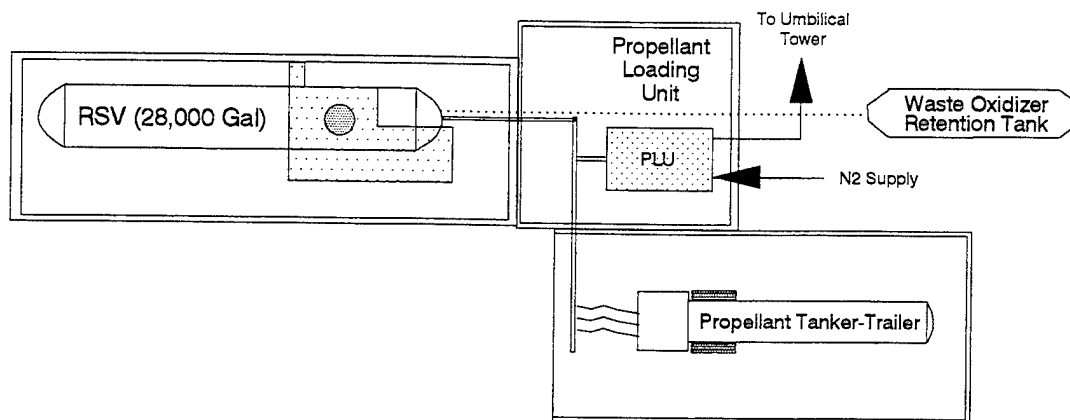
VAFB Titan Oxidizer Holding Area (OHA) Site Plan.
